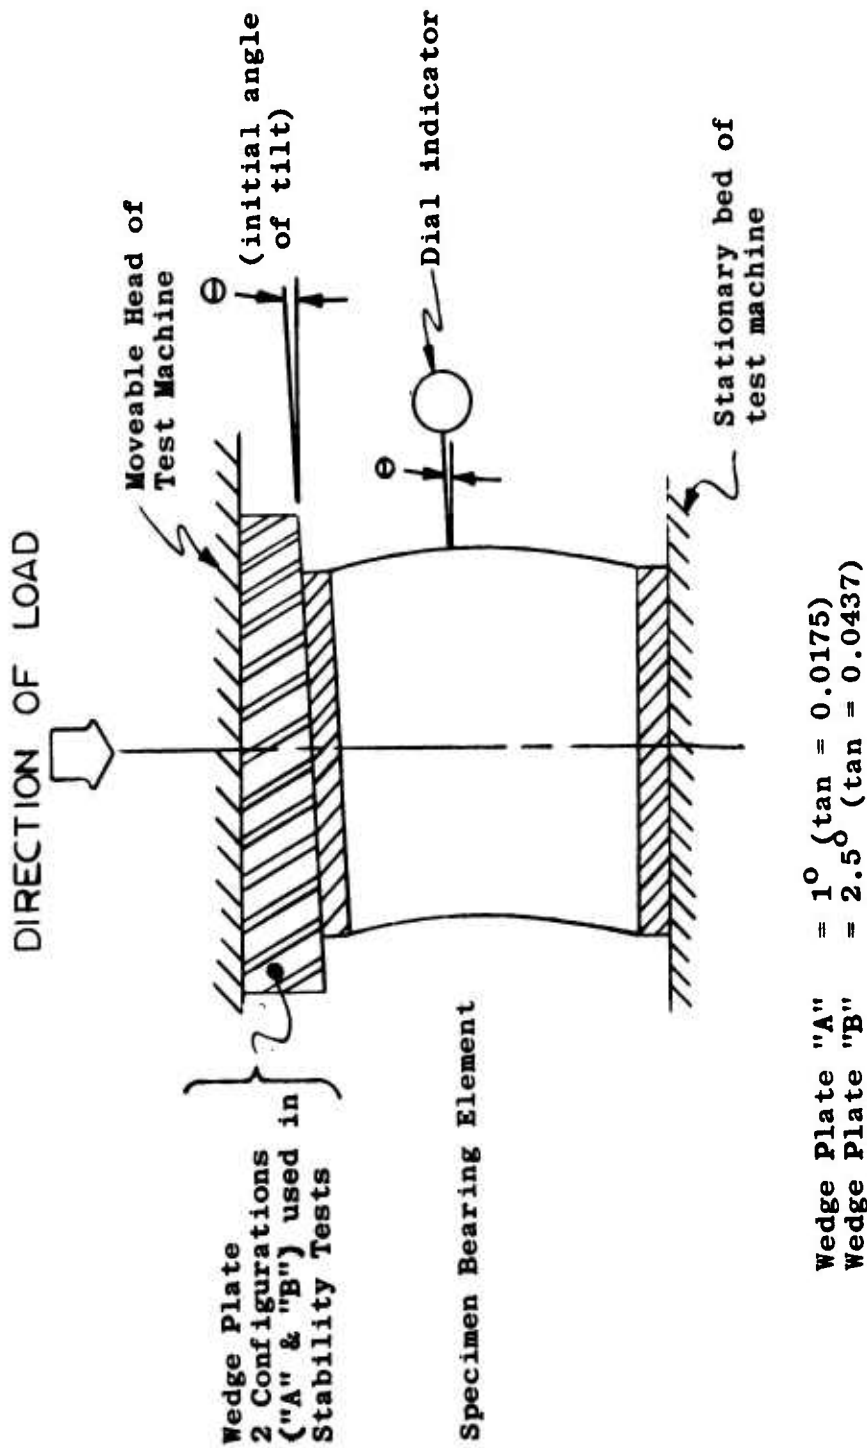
Installation of Axial Compression and Stability Test Specimens in Test Machine
